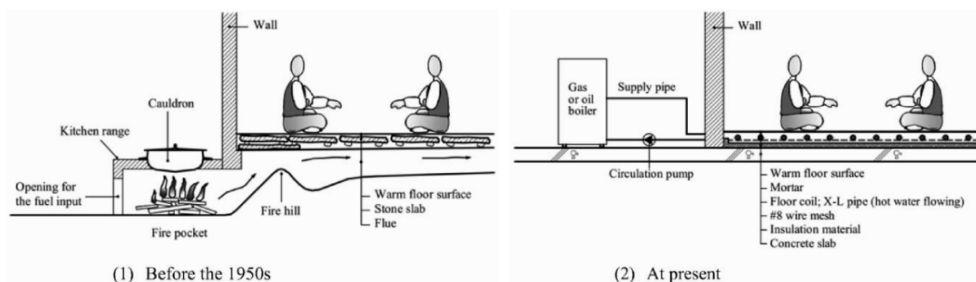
Ondol underfloor heating system used in Korea (Gook-Sup Song, 2005)
